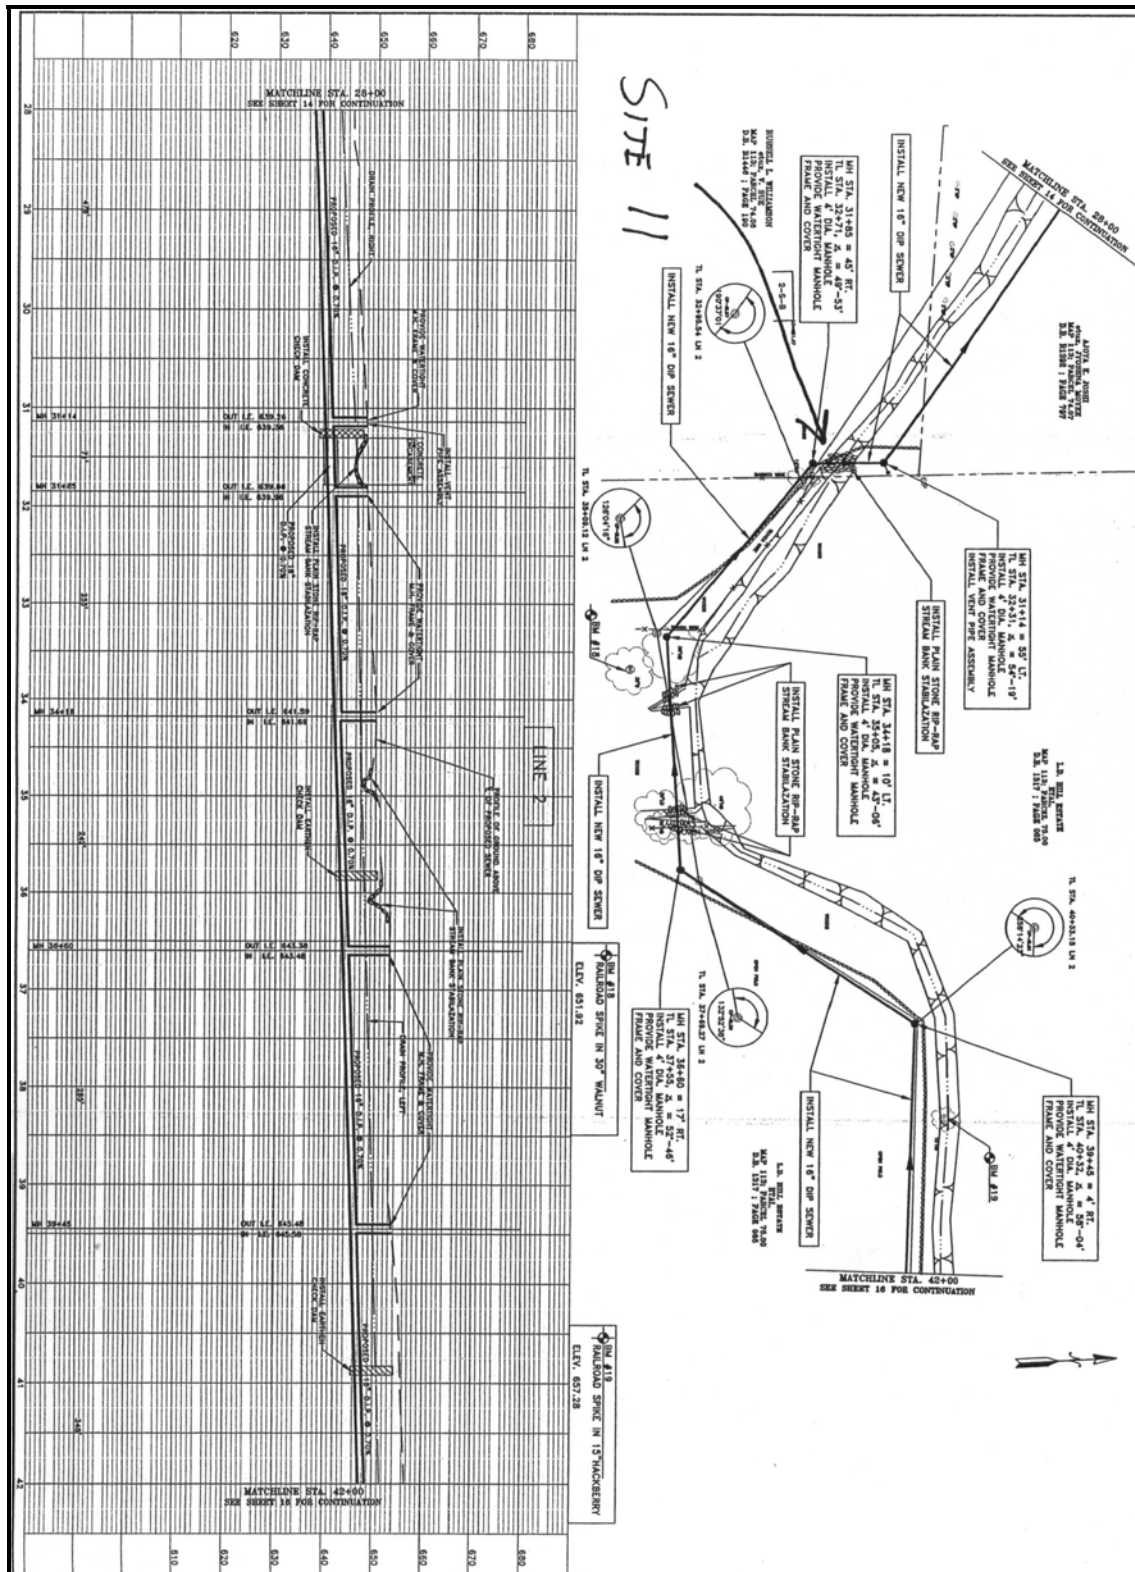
Plan sheet 15, site 11 on Unnamed Tributary to Little Bigby (new crossing)
